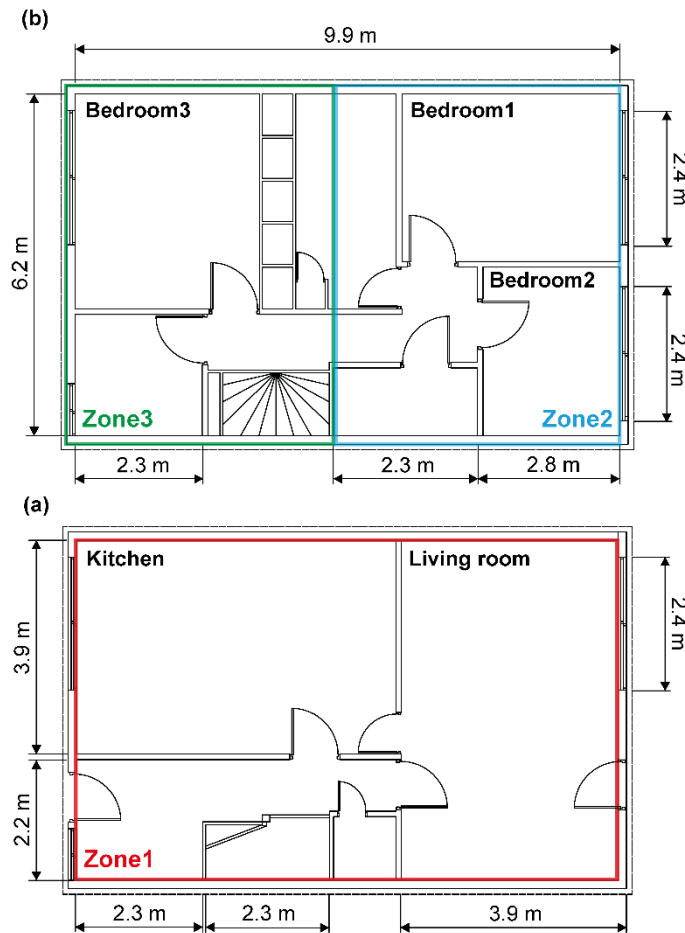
A layout for the two-story Emmen's dwelling: (a) first floor (Zone 1) highlighted in red, and (b) second floor (Zone 2&3) highlighted in blue and green, respectively
